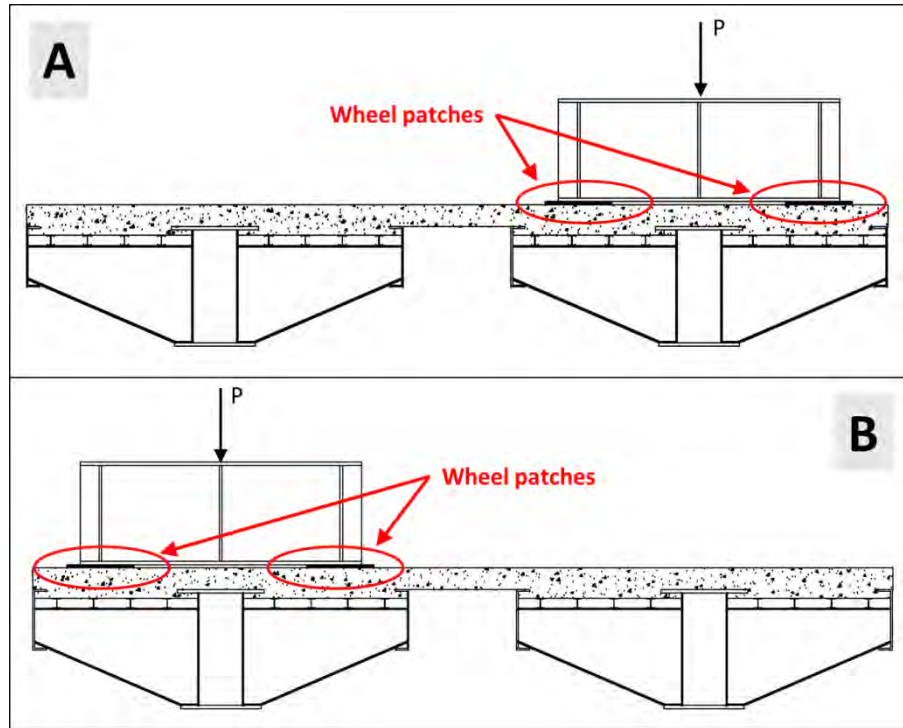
Test 6 (A) & Test 8 (B) load set-up at midspan (looking south)
